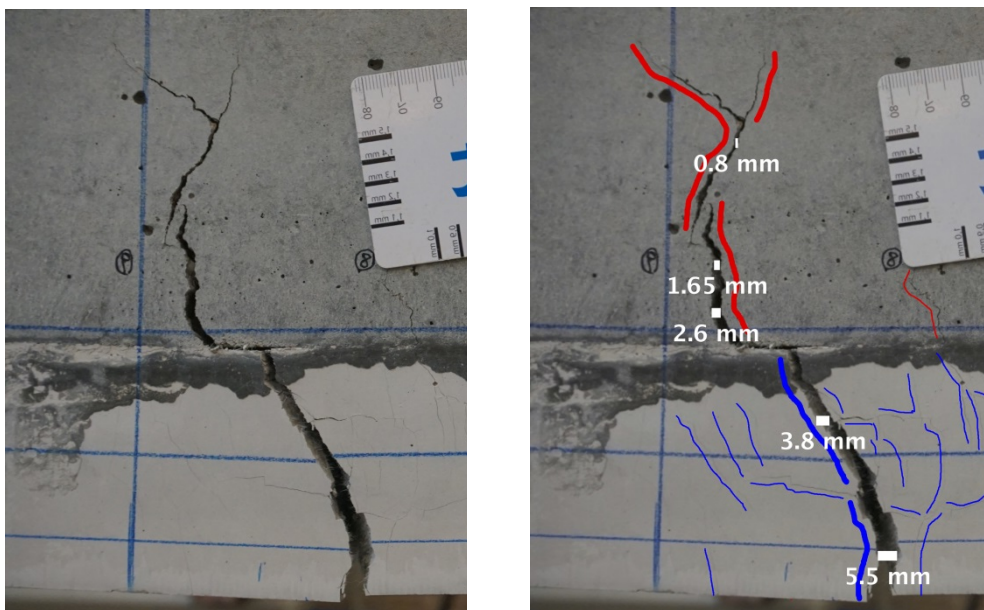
First localized crack, after failure, under the force of 40 kN from beam with SHCC+SH layer of 70 mm without labelled crack width (left) and with labelled crack width (right)
